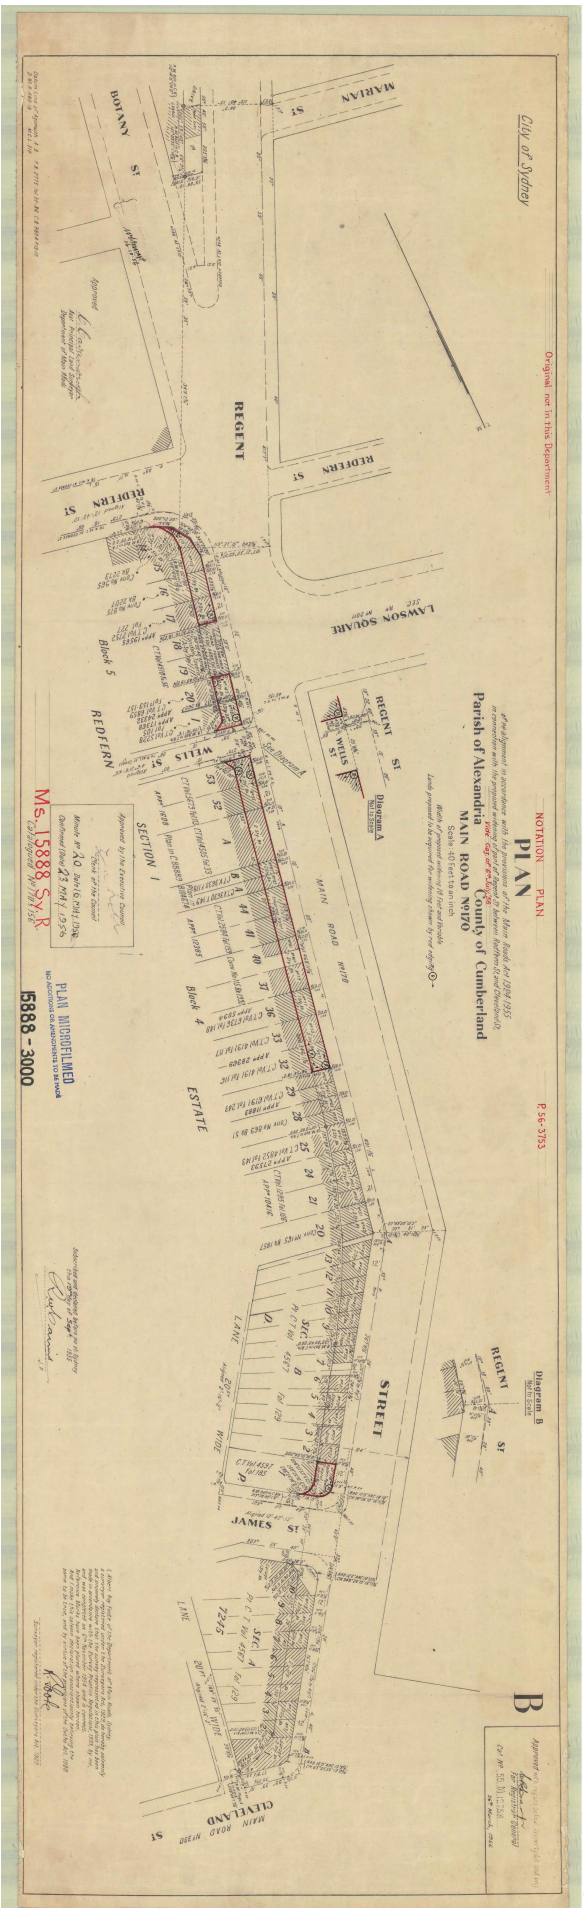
1956 Crown Plan 15888-3000 showing proposed Botany Road widening.
